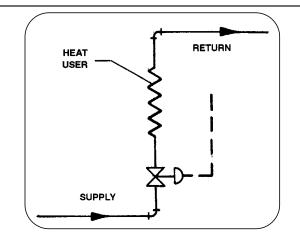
Throttling or Modulating Valve (Electric or Pneumatic)
